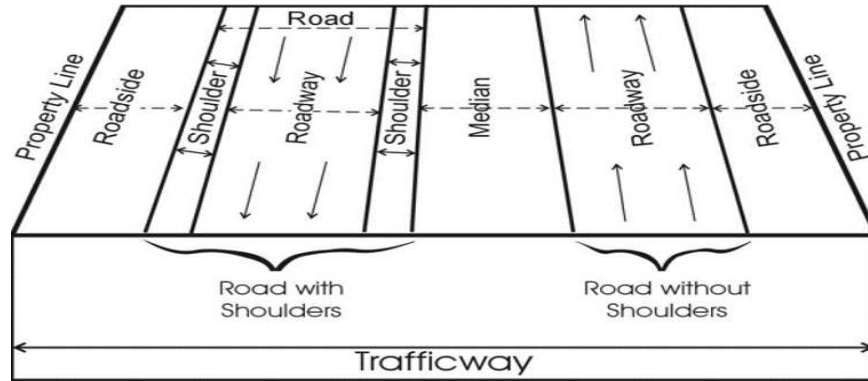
Typical Traffic Way Layout of the US Roads.
